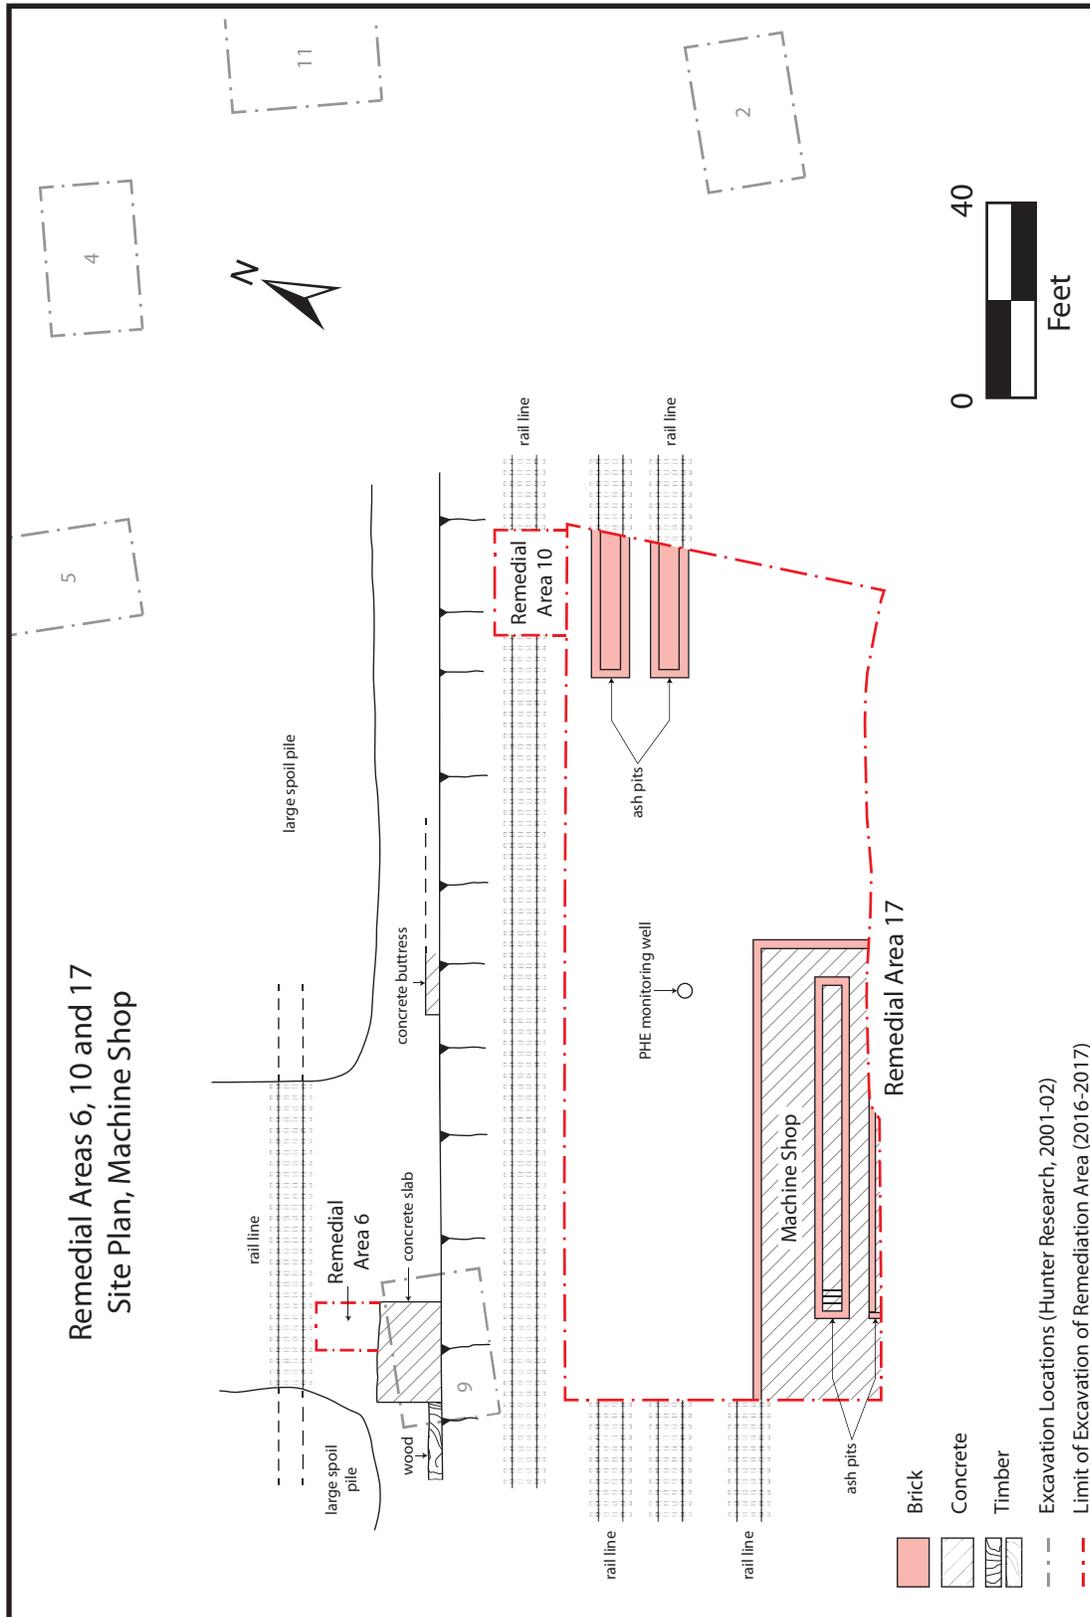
Remedial Area 17, Site Plan, Machine Shop.
